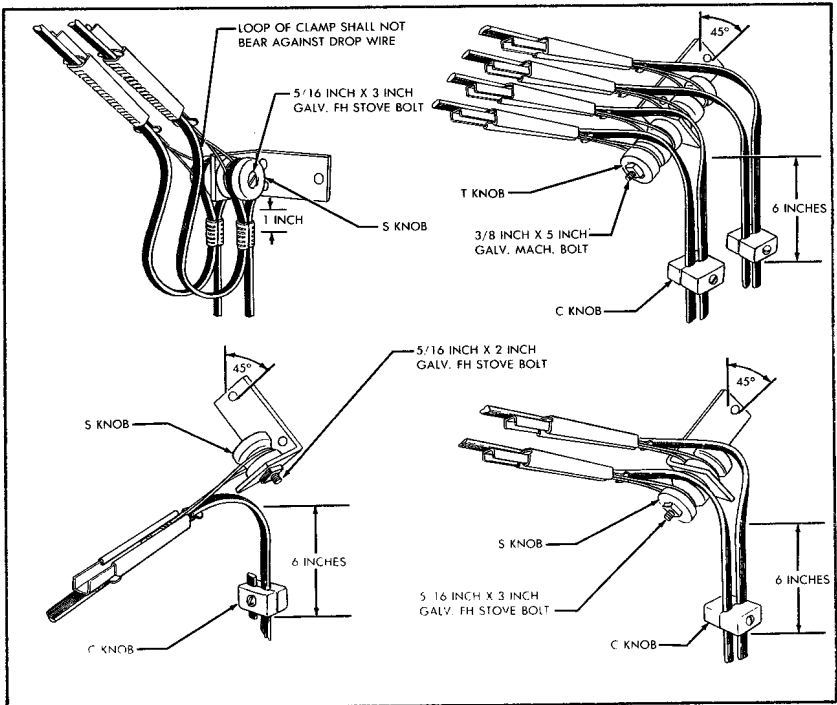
First Attachment, House Bracket (Drop Wire Run in Vertical Direction On Building)
